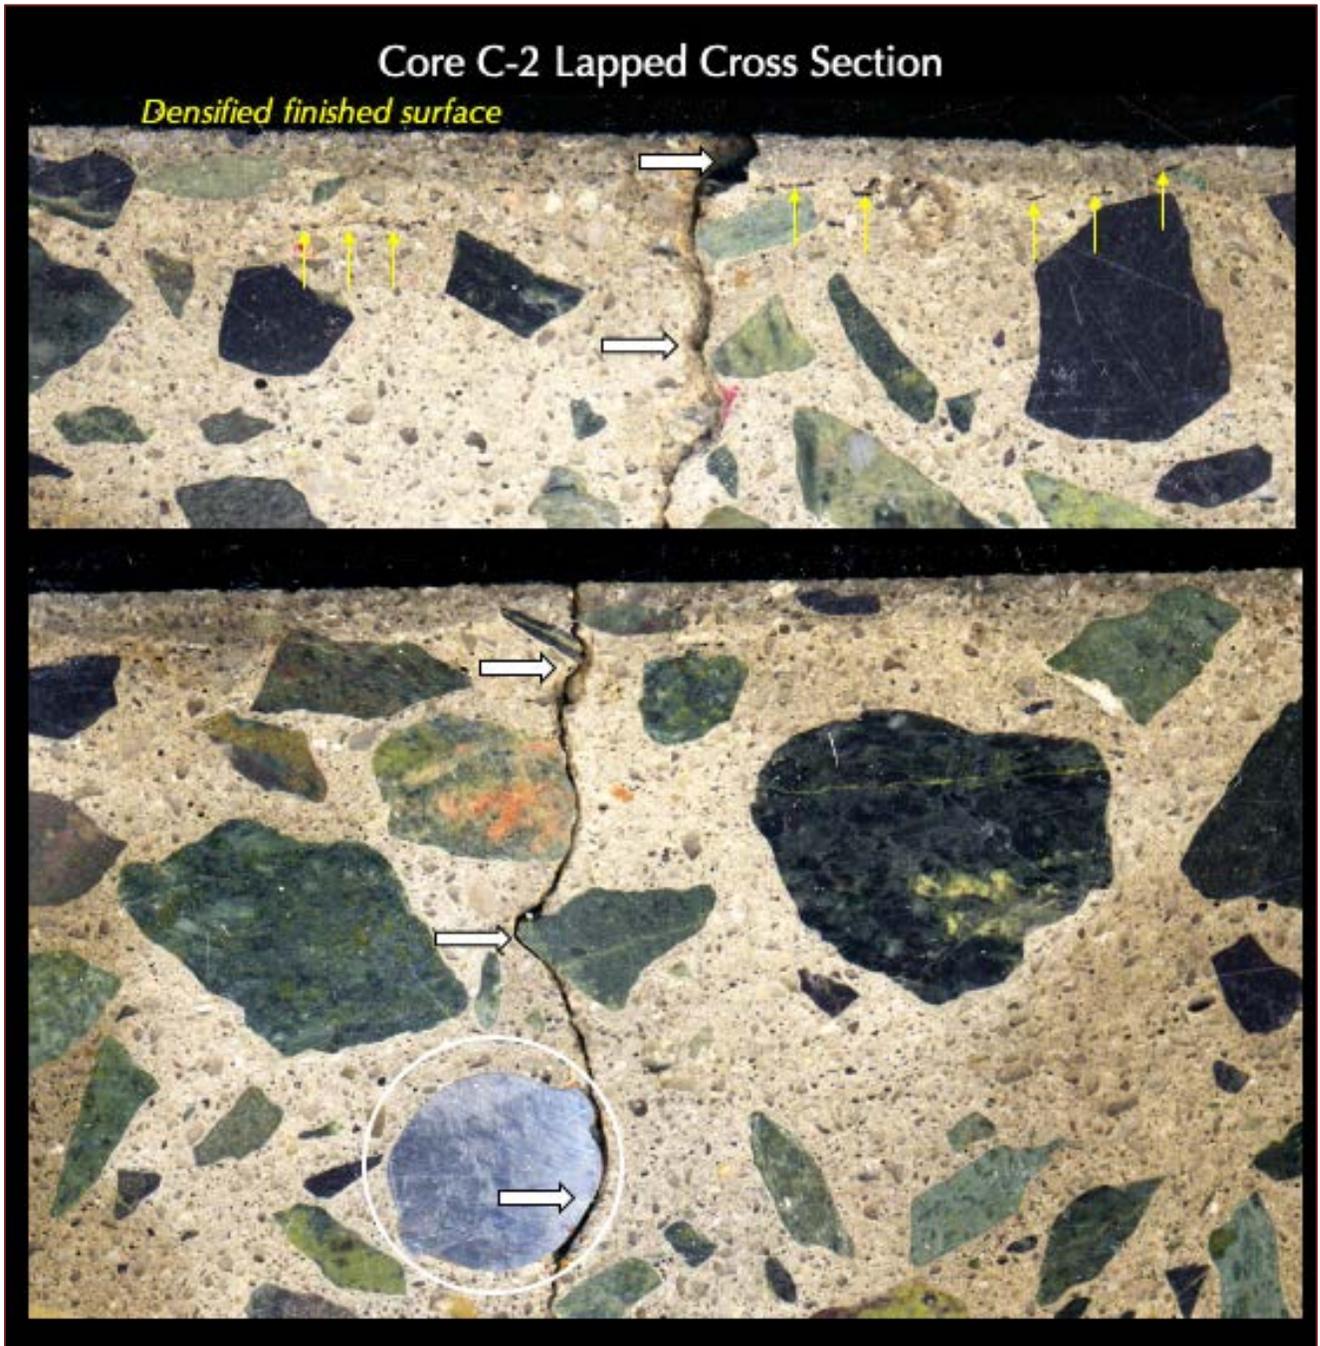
Lapped cross section of reinforced concrete roof top slab (RCS) portion of Core C-2 showing crushed volcanic stone coarse aggregate of 1 in. (25 mm) nominal size which are dense, hard, medium greenish-gray to black, angular, equidimensional to elongated, sound, well-graded, and well-distributed. Notice the darker gray densified finished surface at the top $\frac{1}{8}$ in. due to finishing-induced densification of the surface.
